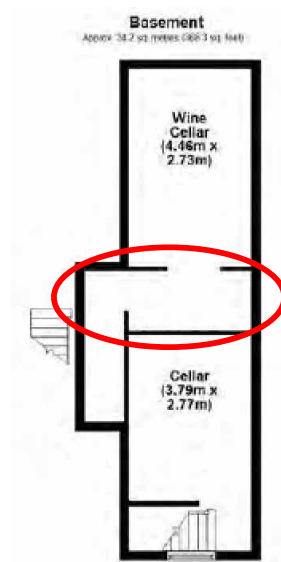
Section of basement ceiling with rotted timbers (red circle)
